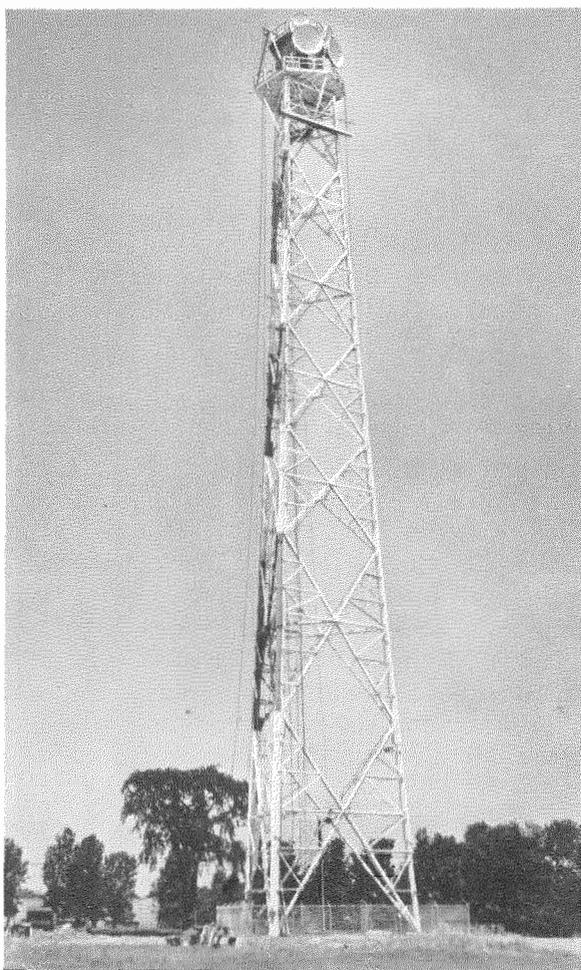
200-foot wooden tower at Nutley, New Jersey.
